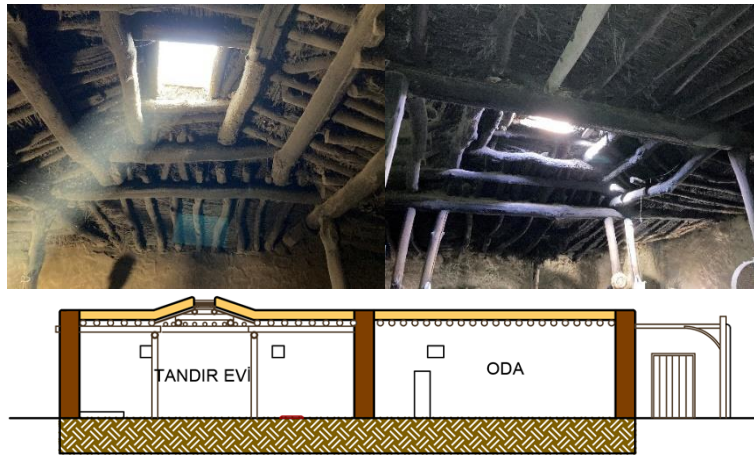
Corbelled roof section, plan and view of tandır houses (Şeker Archive).
